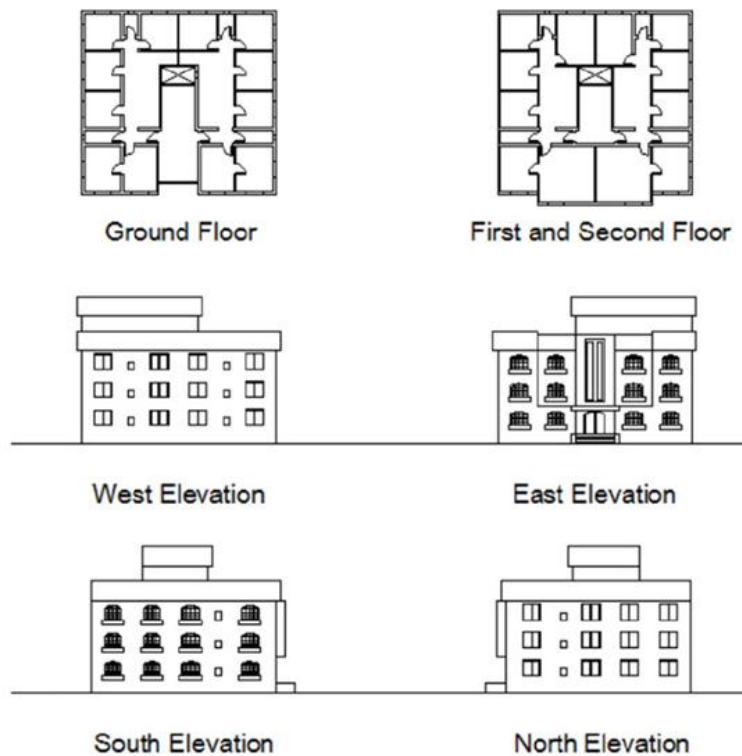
Design layout of typical apartment building in Saudi Arabia, and Almoraj.
